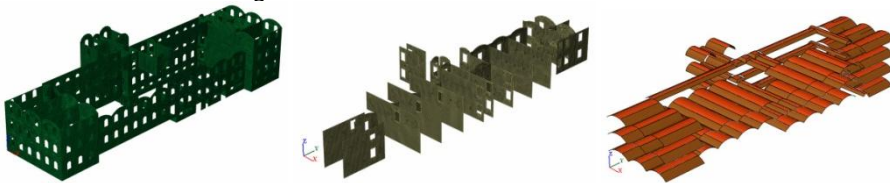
External brick masonry walls (left) stone walls (centre) and vaulted system (right)
